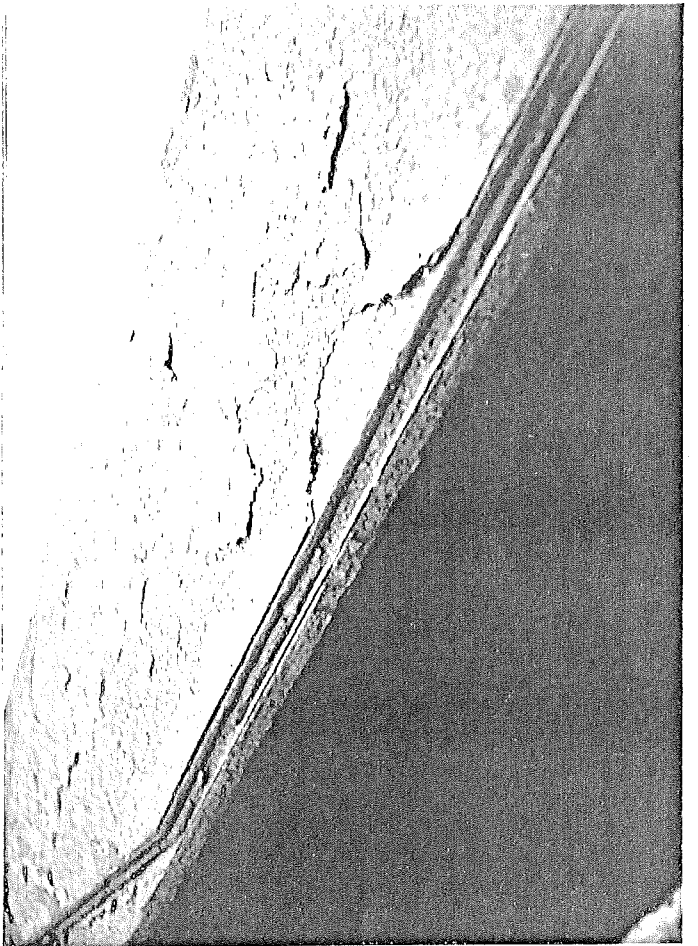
Corrosion of welded cover plate detail due to salt spraying after 14 years of service.
